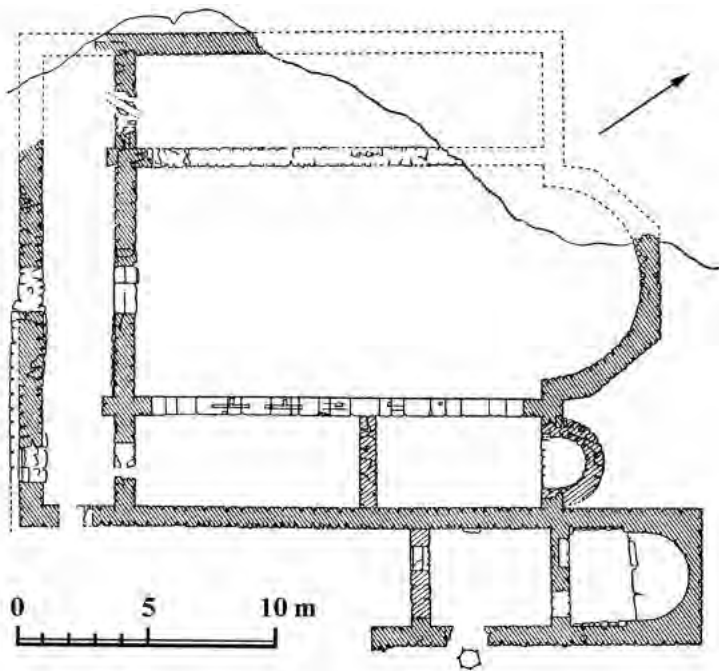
Church No. 22, "North Basilica". Excavation Plan (after A. Jacobson [5, fig. 75]).
